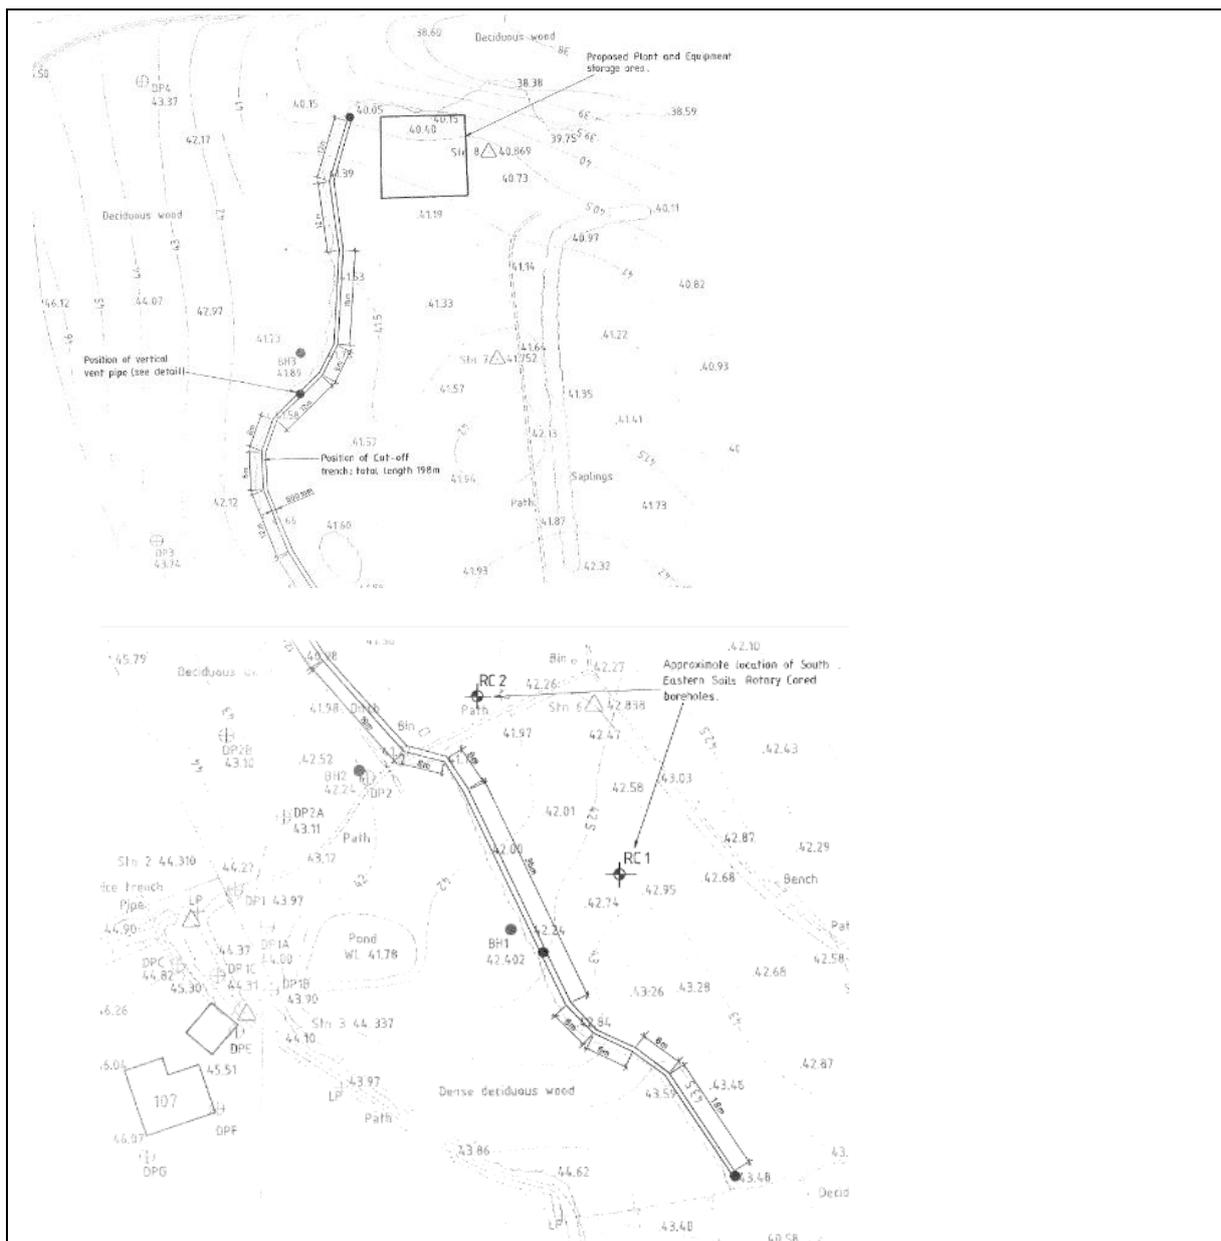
Extract of Ventilation Trench Location (from TMBC)
